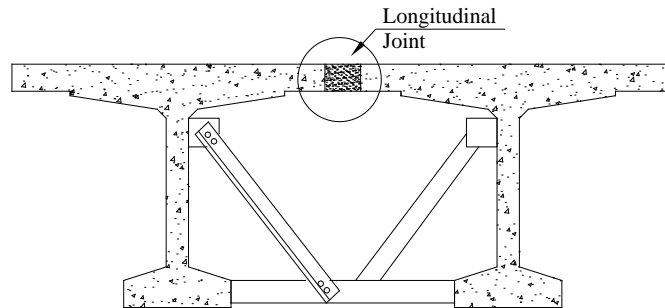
Steel Diaphragm Connecting Adjacent Girders at Midspan
